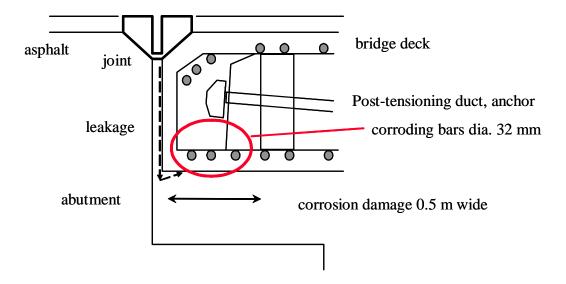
Sketch of cross section Dommelbruggen, Den Bosch, NL
